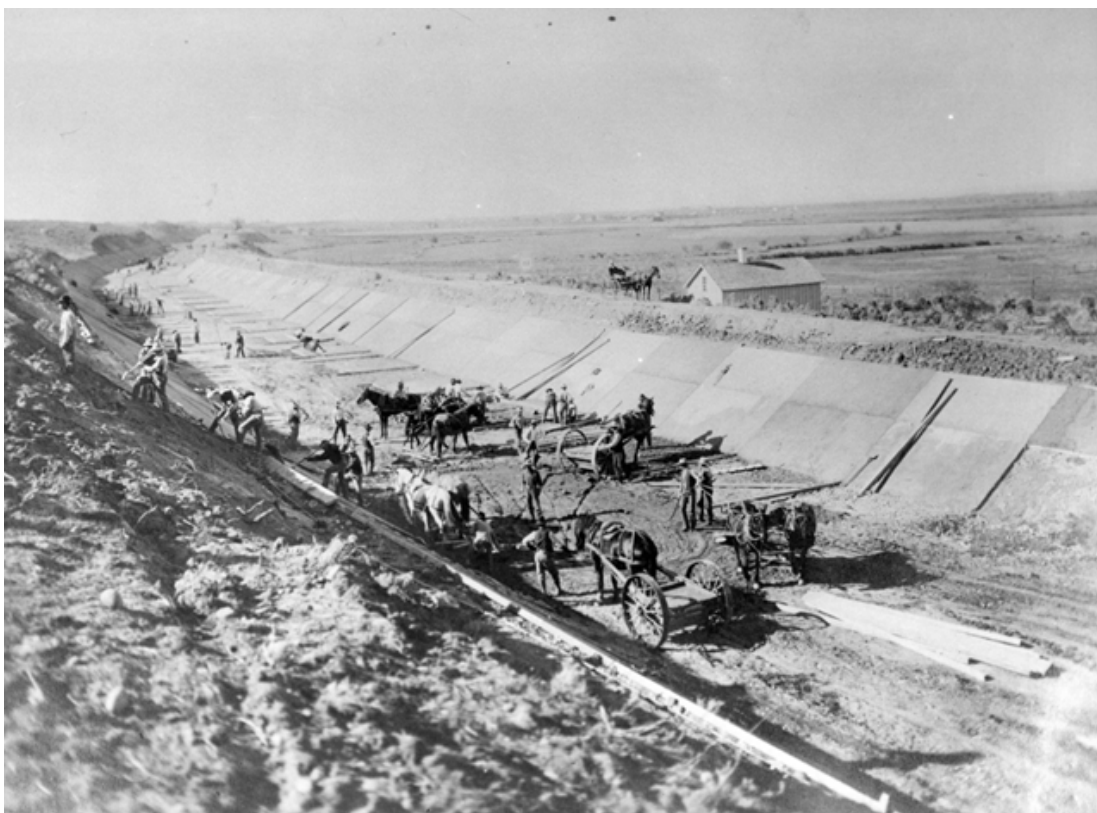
The New York Canal under construction, circa 1906-1908, P1960-77-1, Idaho State Archives.
